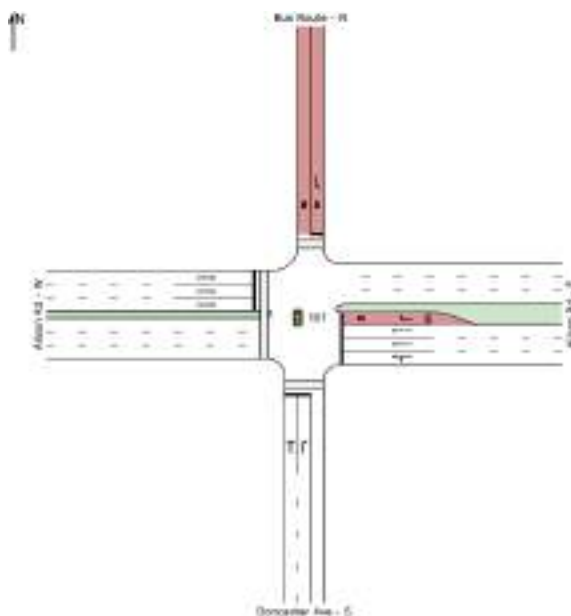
Proposed Doncaster Avenue/ Alison Road layout
